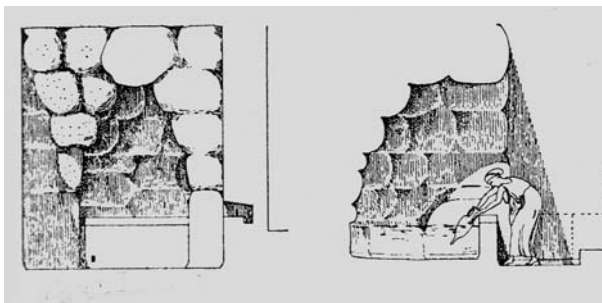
Cyclopean Fountain elevation and section, Corinth (Hill 1964, 47)
